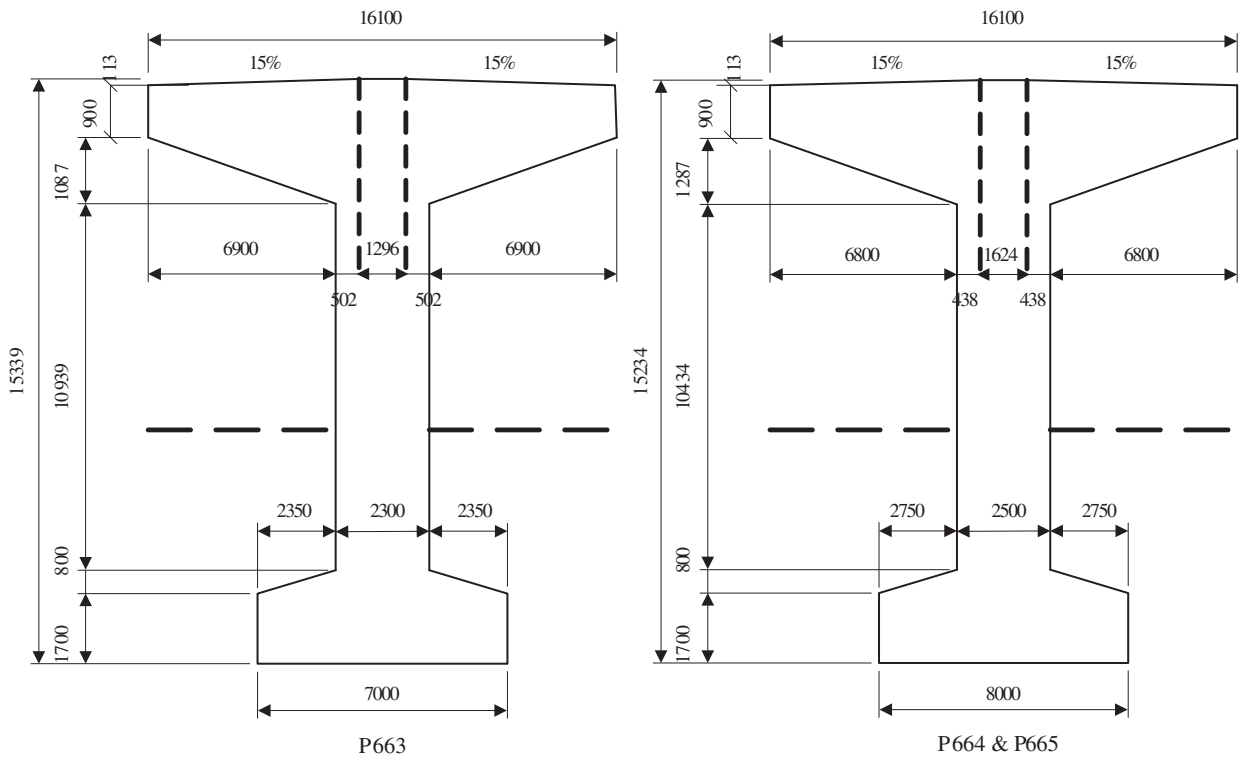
Details of piers for the Hanshin expressway: (a) dimensions of piers and (c) cross-sections of piers.
